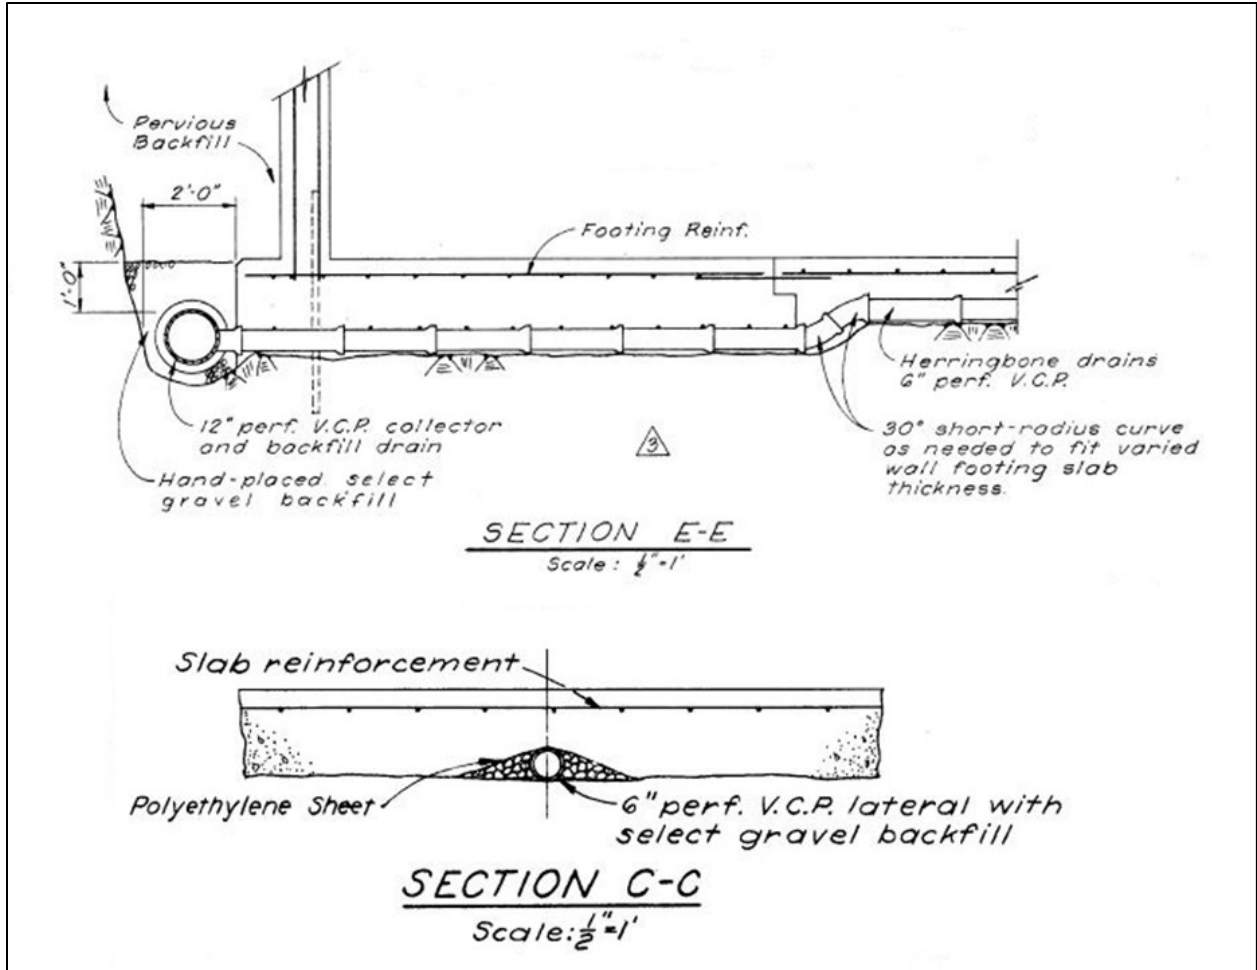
Upper Spillway Chute Drains Showing Herringbone and Collector Drainage (top) and Herringbone Installation Beneath the Chute Slab (bottom) from As-built Drawing A-3B5-3
